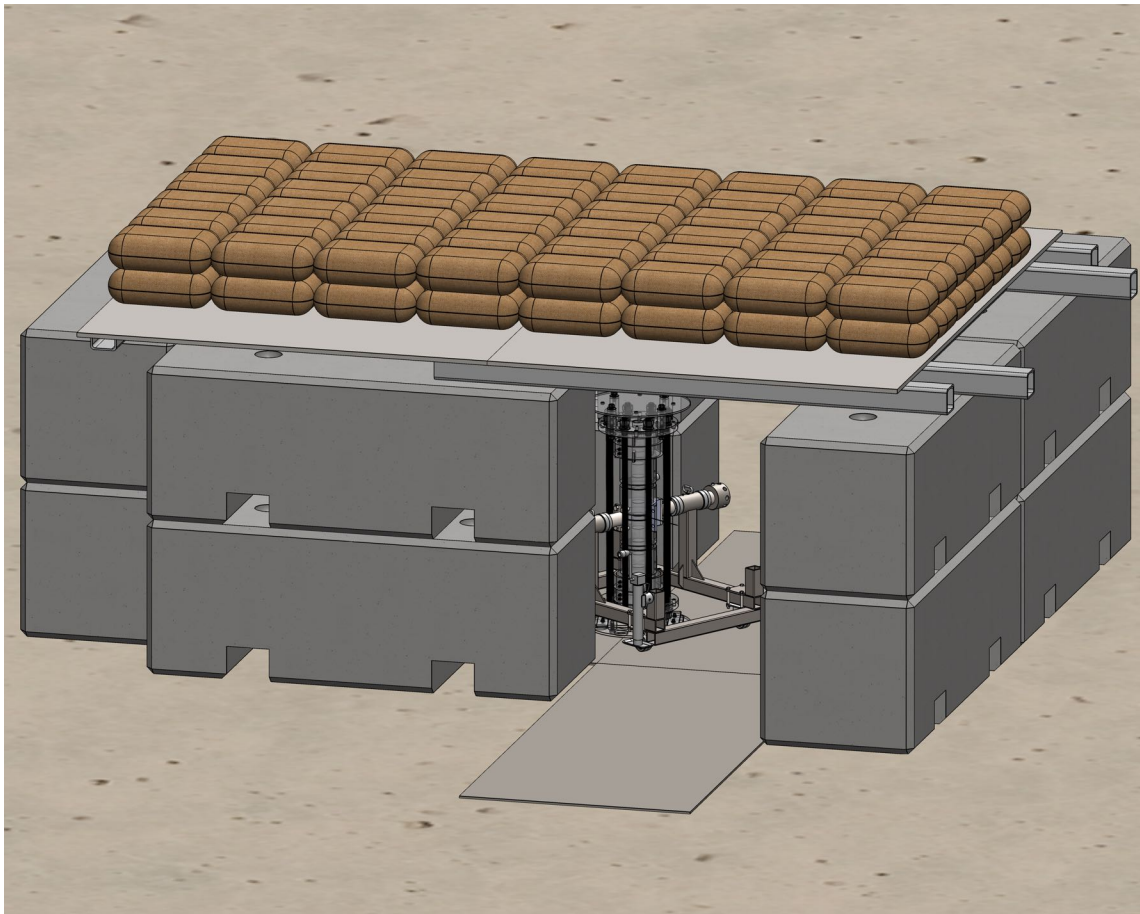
Blockhouse shown with sandbags over steel constructed roof
